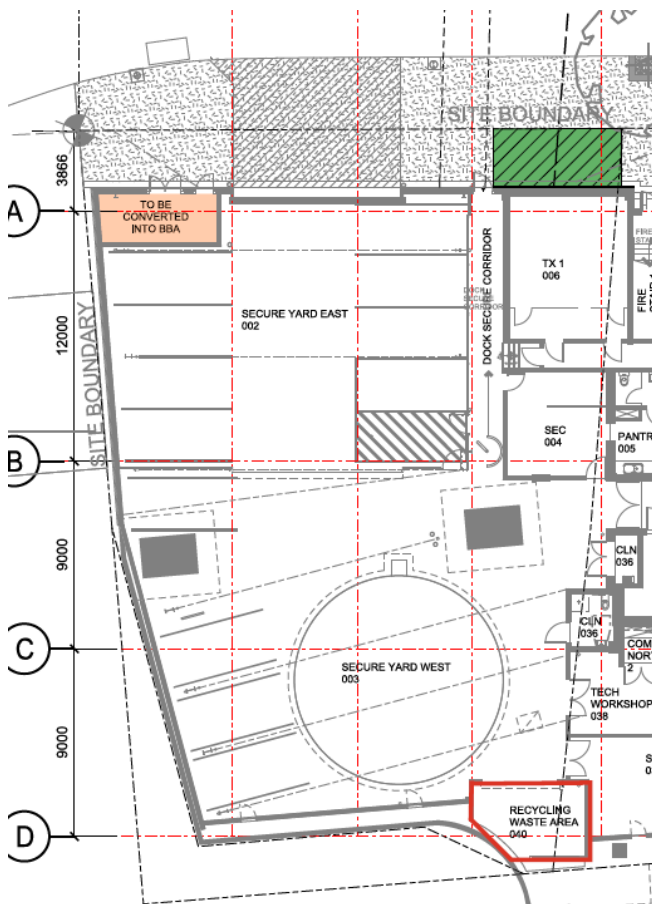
Waste storage area locations – All Buildings - ground floor SYDE – Drawing ar-1201
